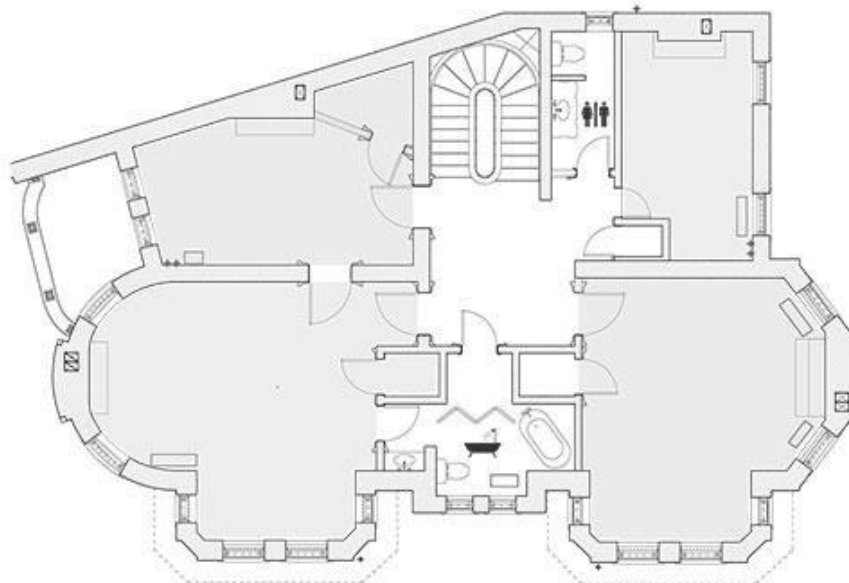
Old Korean Legation Building. Second Floor. Looking west.
